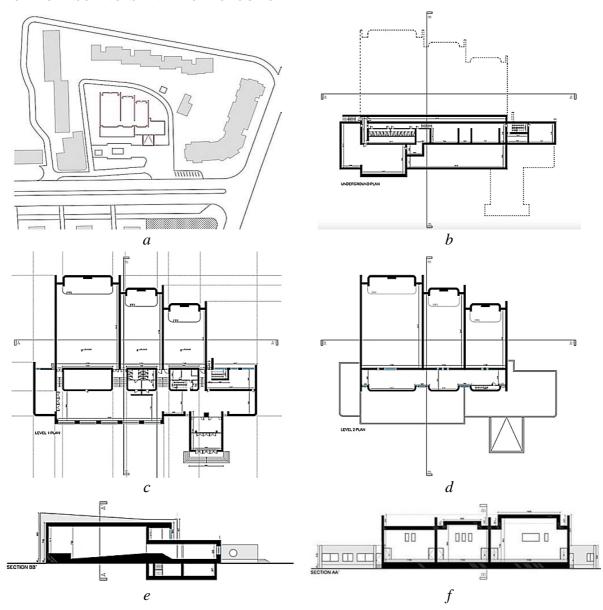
Architectural Plans of the Existing Building: a – general plan; b – ground floor; c – first floor; d – second floor; e and f – sections
